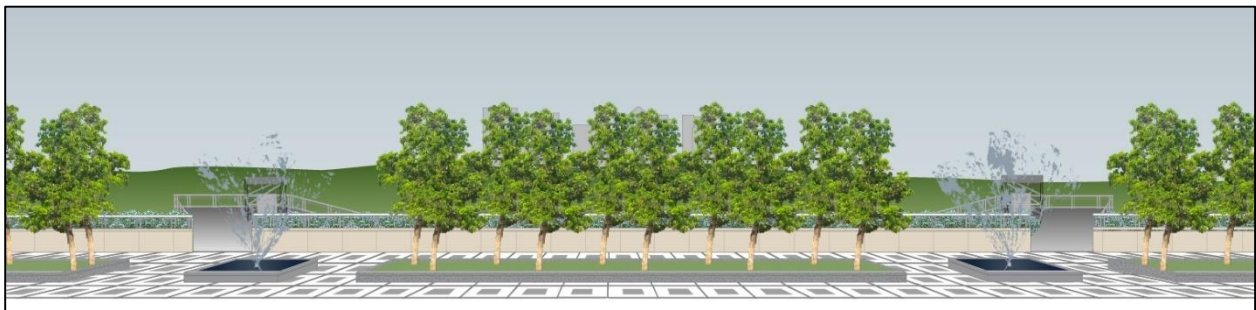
View looking west from the Kennedy Center River Terrace illustrating the staircase platforms, railings, and elevator towers of the River Terrace Access Alternative.
